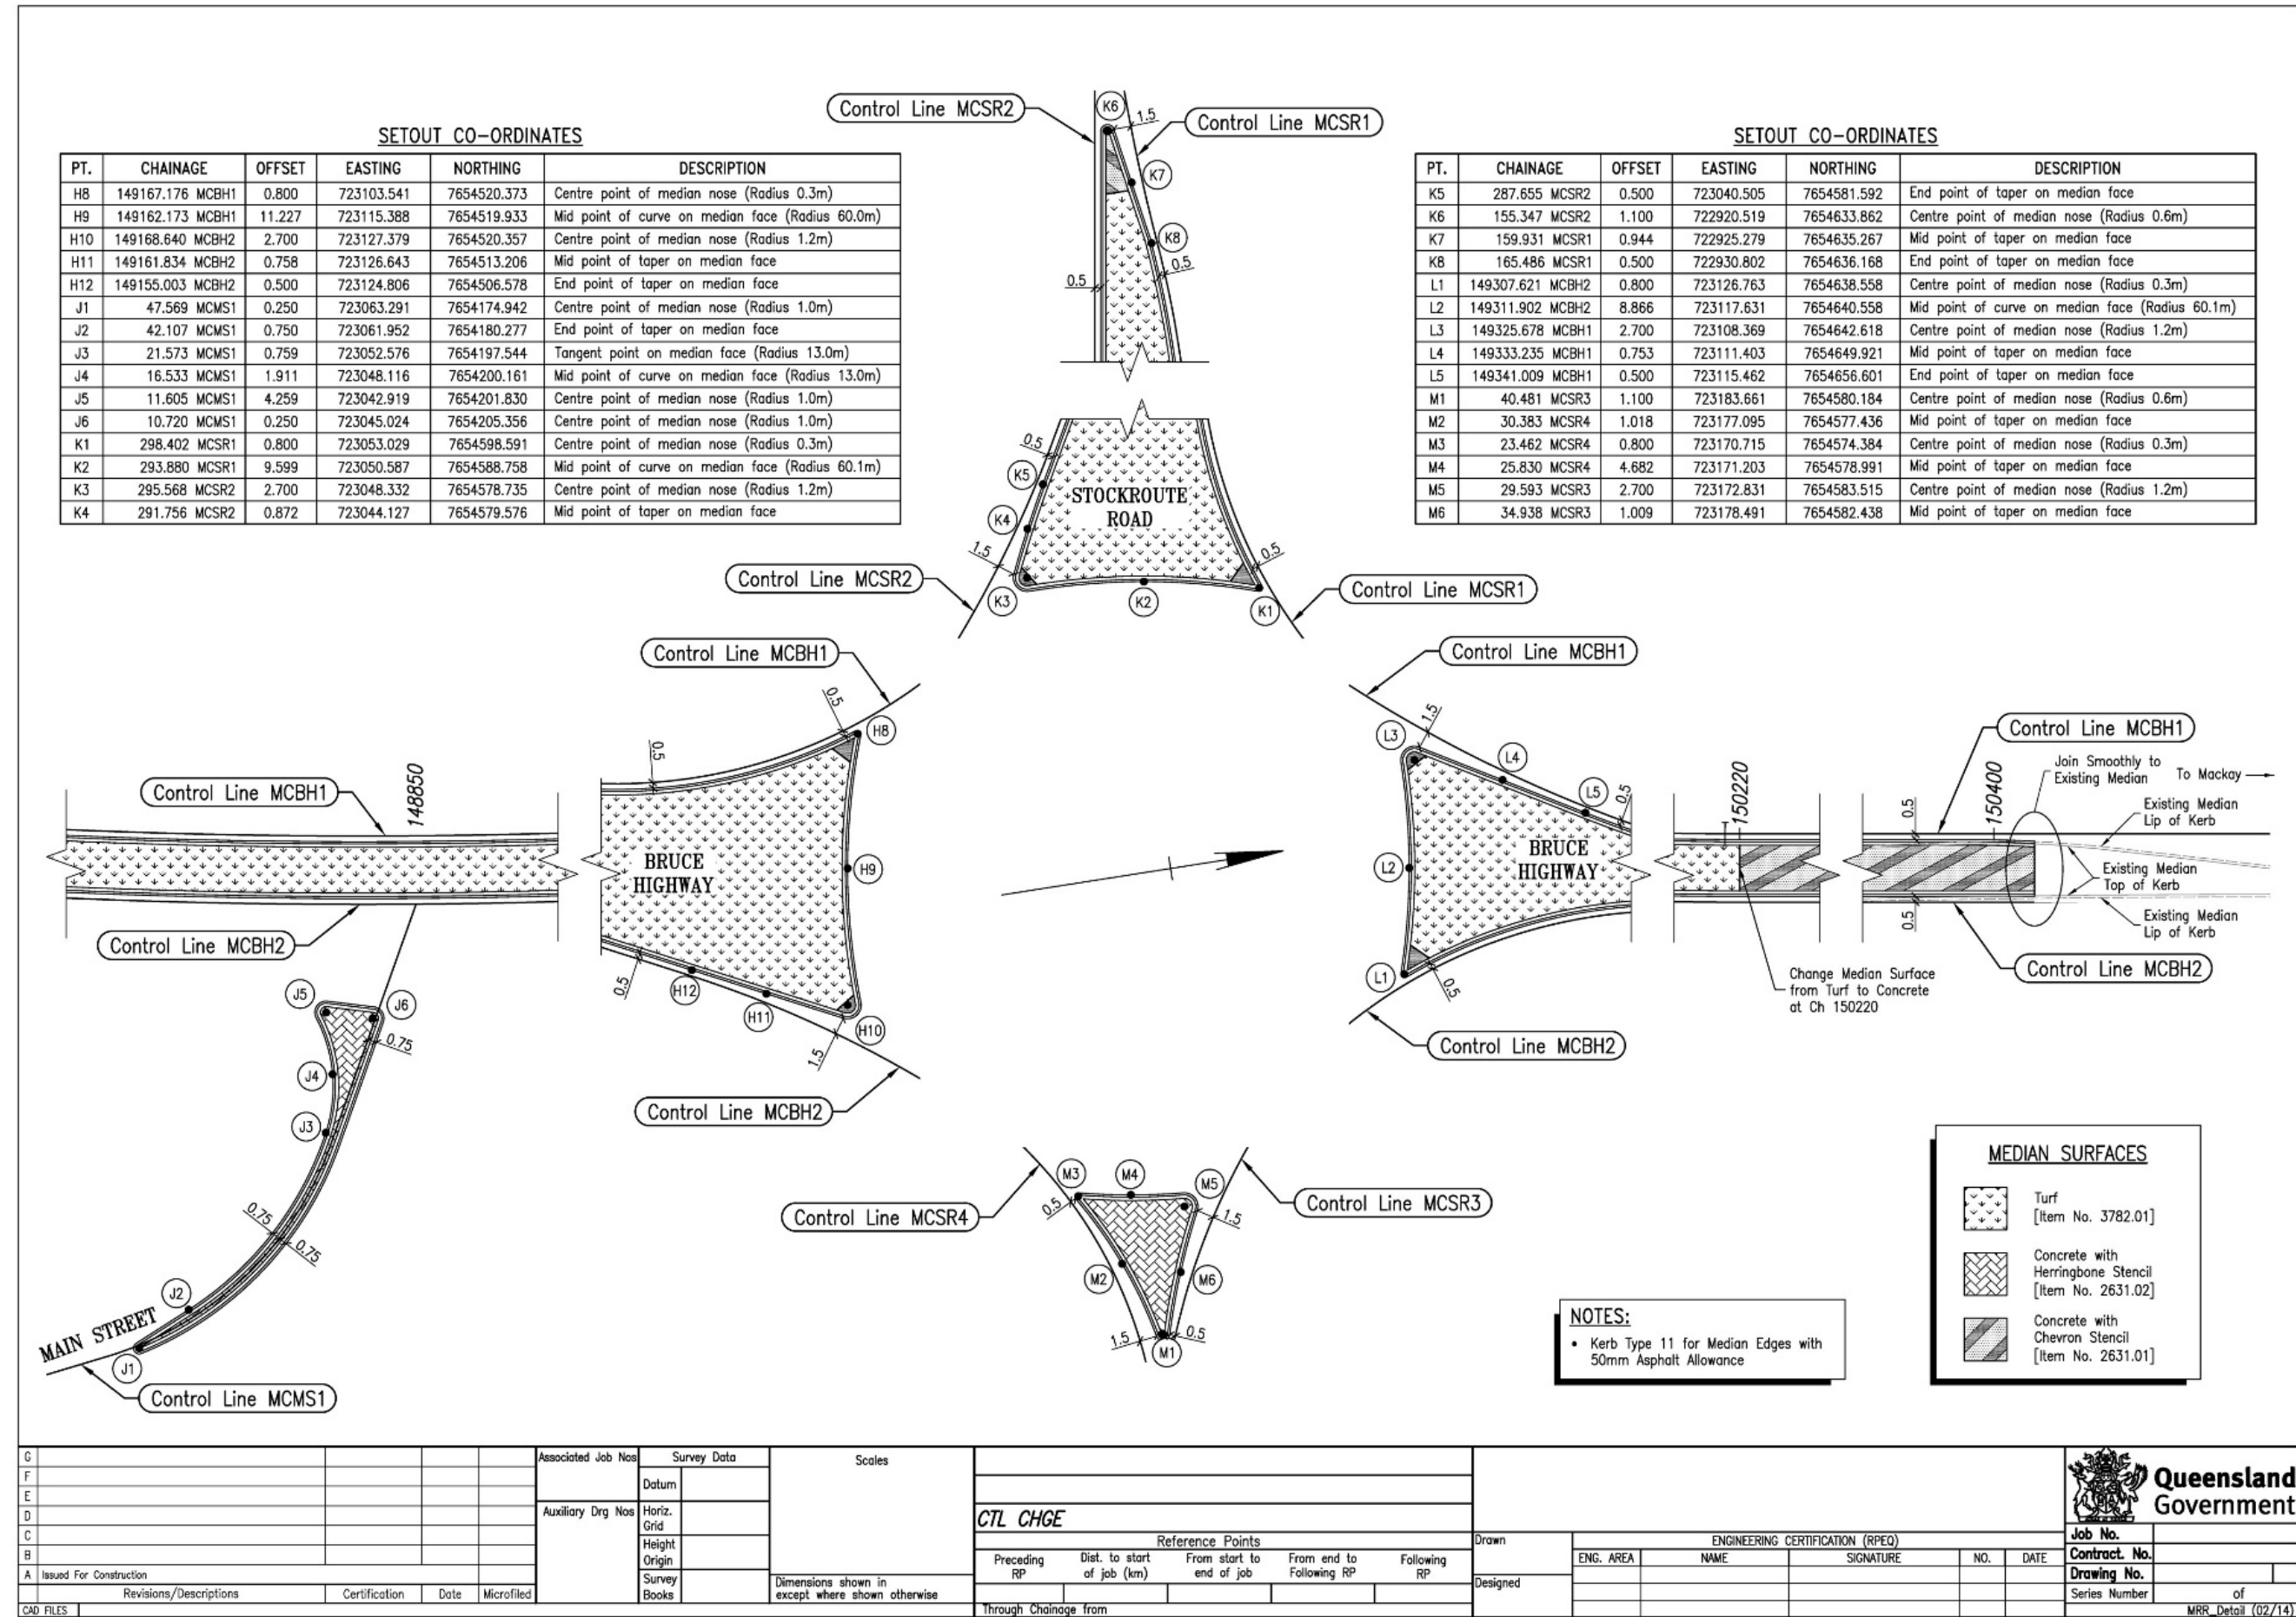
(b) – Intersection details and set-out tables – generic example 2
